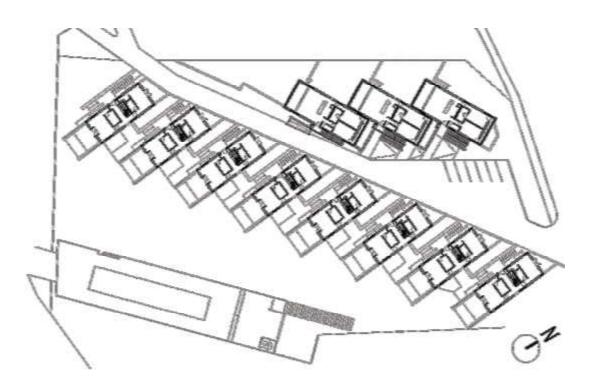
Floor plans of Case Study 5 buildings. Source: Architect (C. Çinici)
